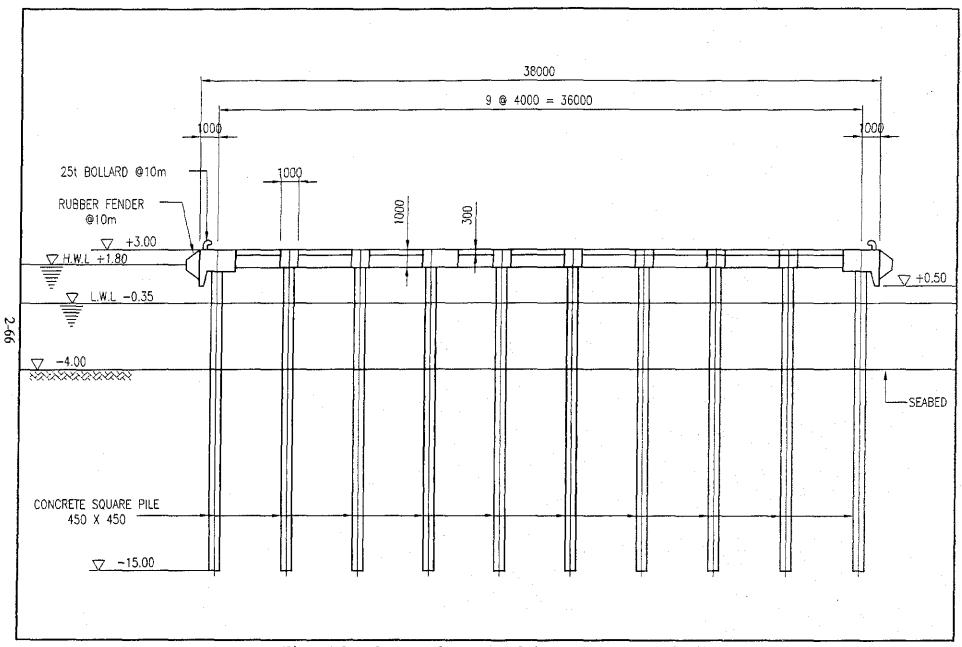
Open Deck Type Berth for Reconstruction of Pier 3
